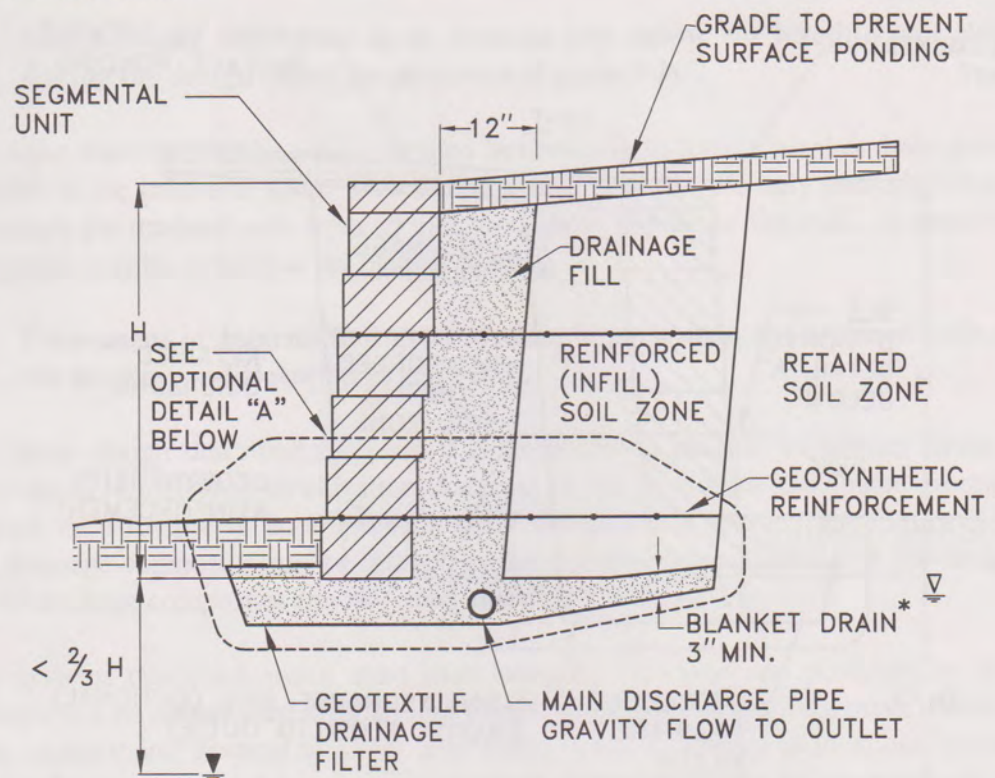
WALL FACE DRAIN - CASE 1
